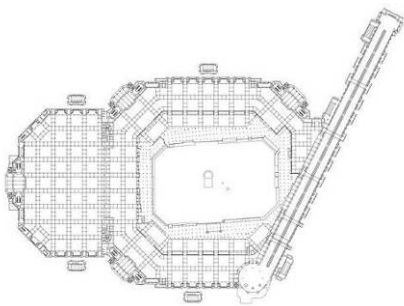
Sample Plan for Drawings for Al-Haram.
